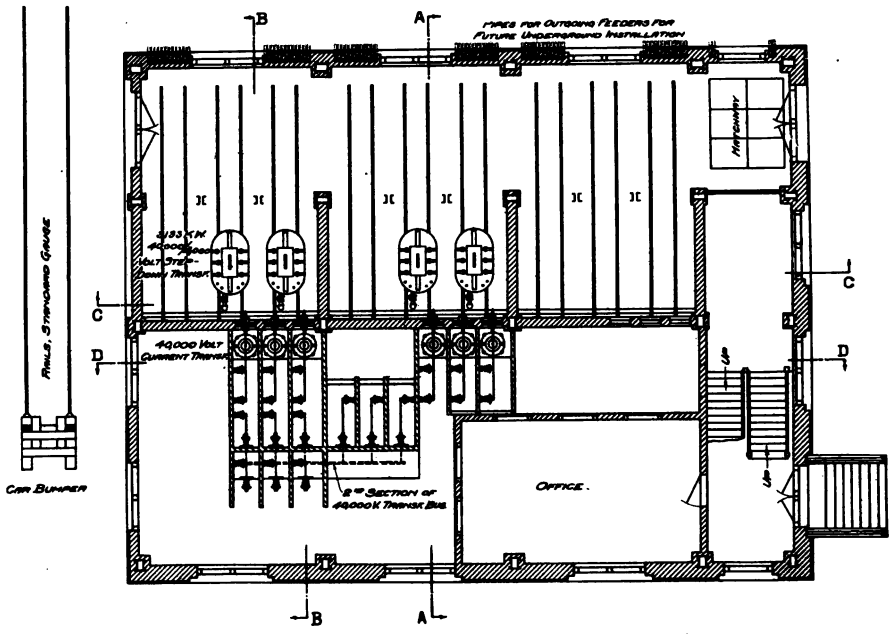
First Floor Plan, Substation, Chattanooga & Tennessee River Power Co.
